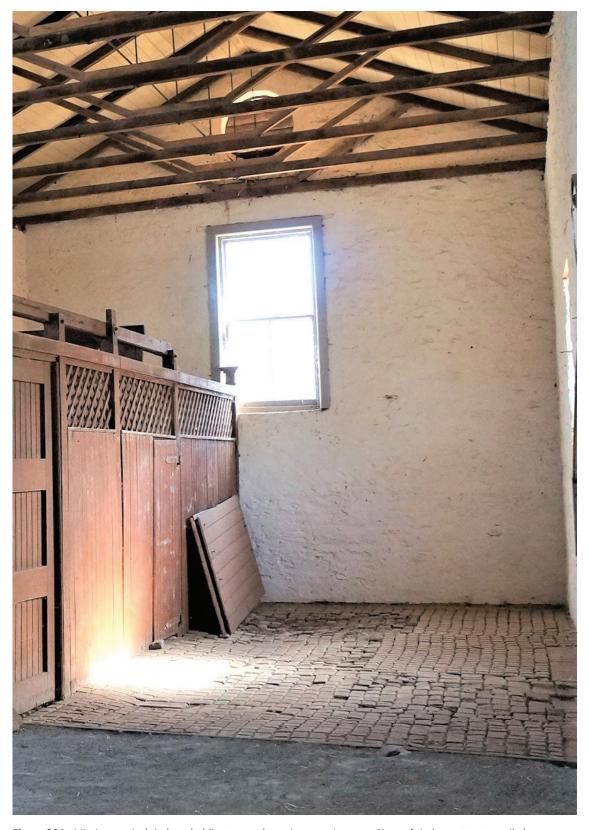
Missing vertical timber cladding to south carriage service area. Signs of timber rot to top rail above cladding may indicate past problems with roof above where the valley gutter meets the box gutter.
